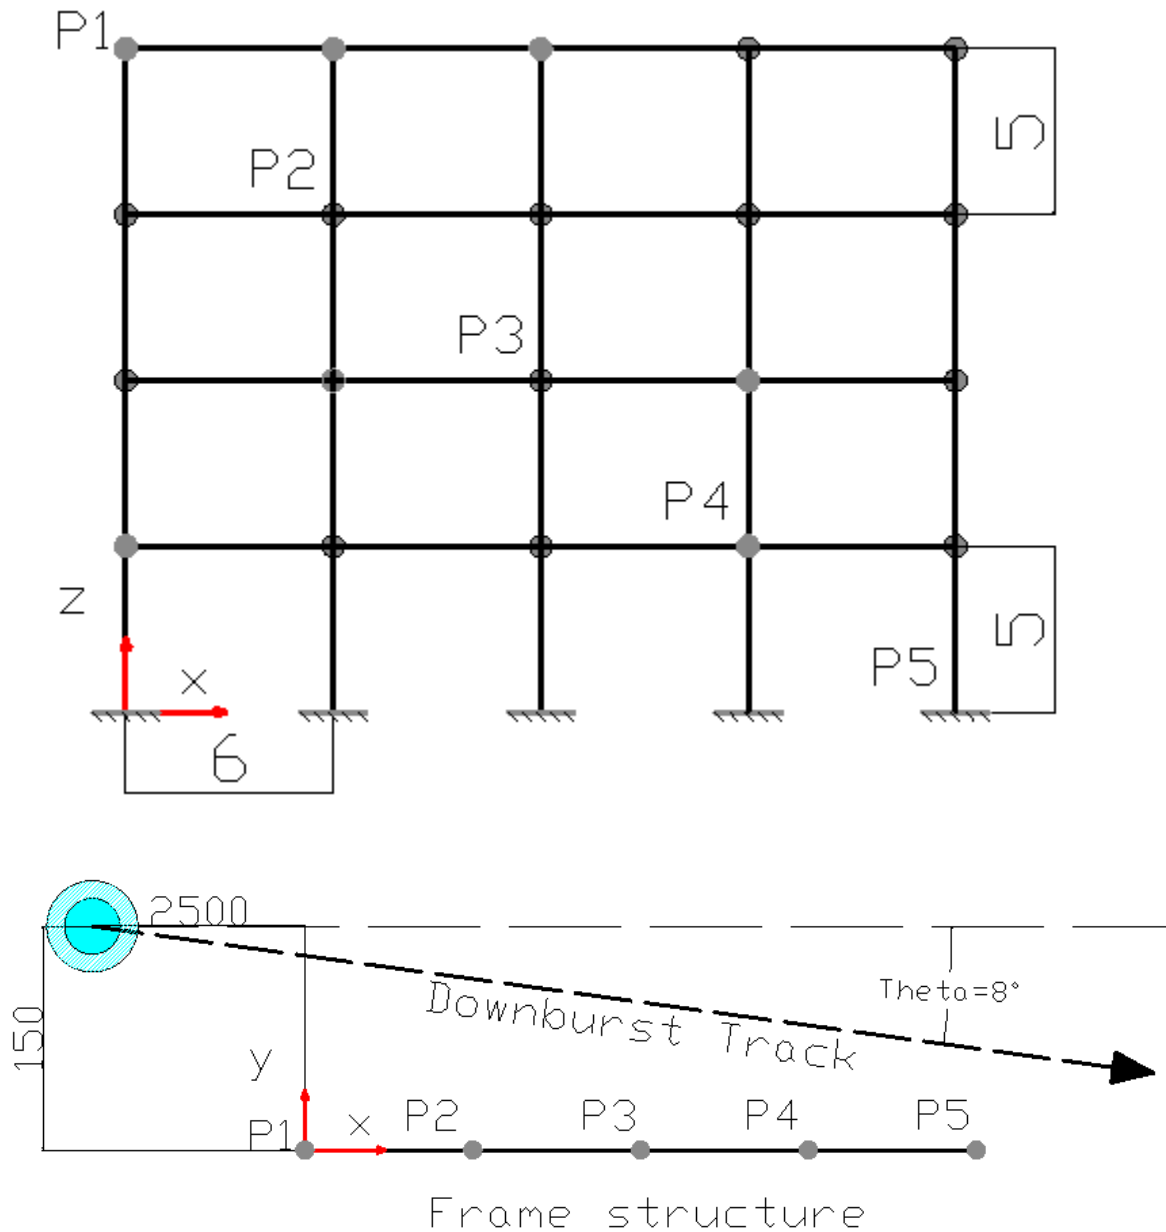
2D frame with 3D downburst. a) Front view. b) Plan view
